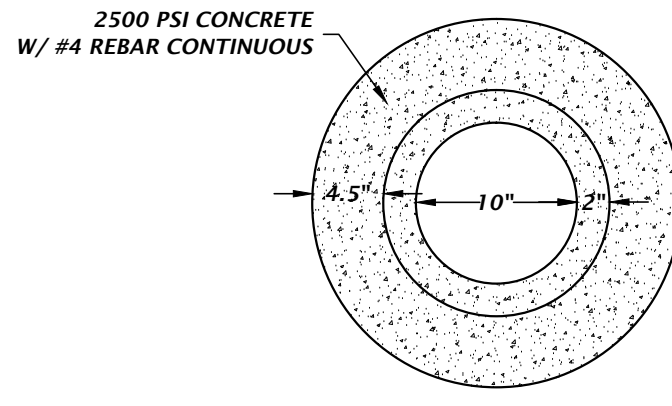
STANDARD DOGHOUSE MANHOLE CONSTRUCTION
